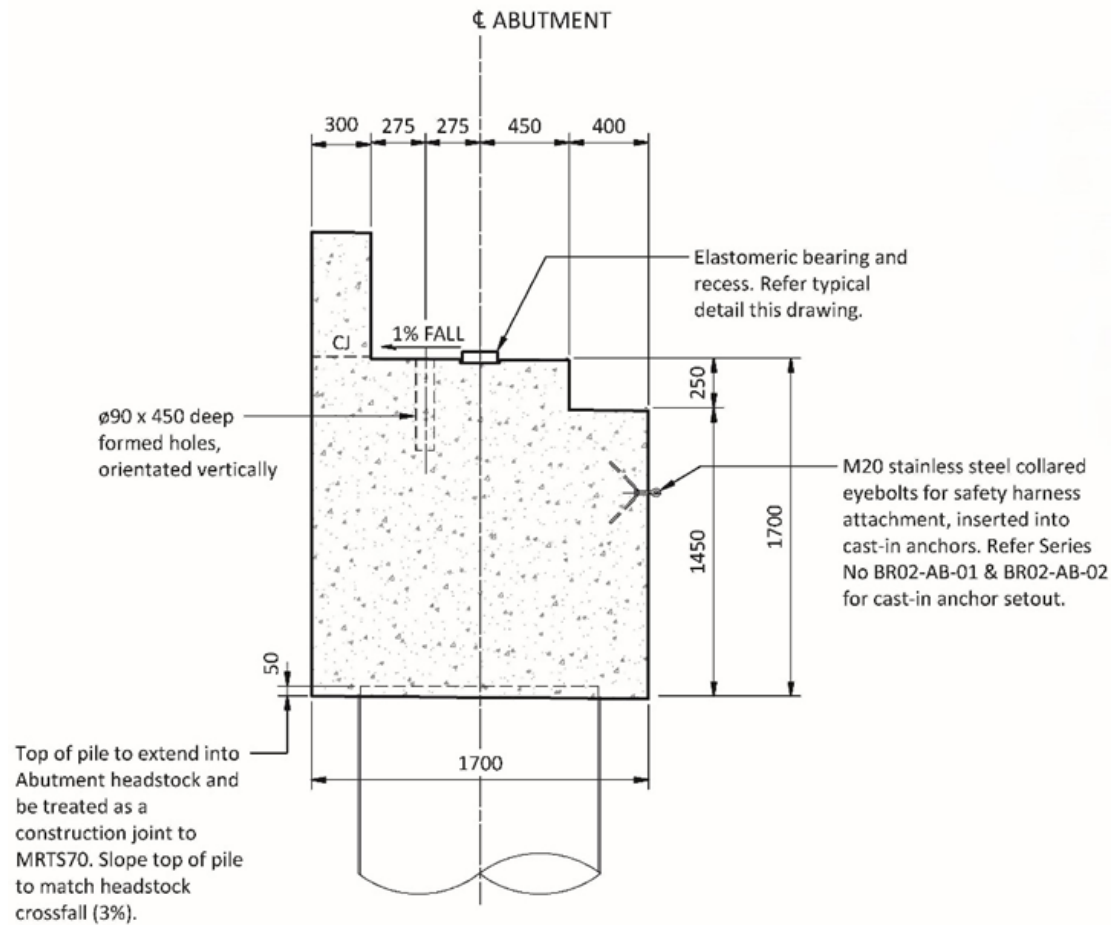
(c) – Example of deck unit with reinforced concrete deck bridge abutment in section with bearing
